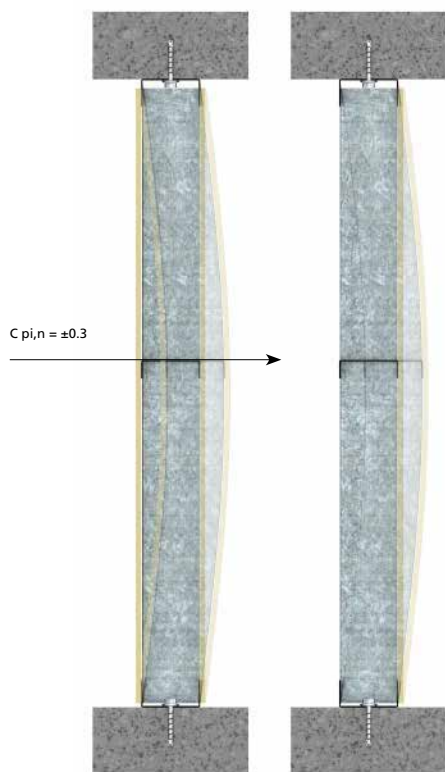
(D): NON PRESSURE SEALED WALL
